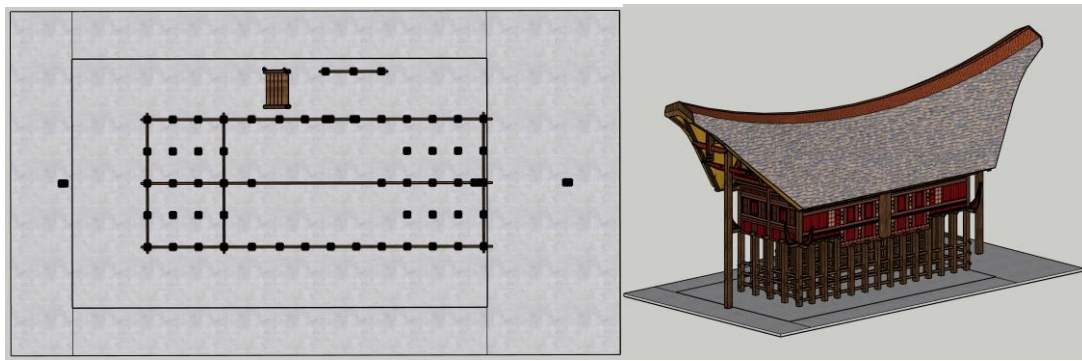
Ground Floor Plan of *Tongkonan* Traditional House Toraja
